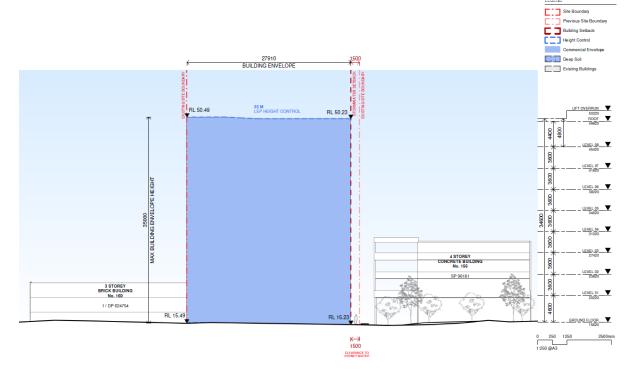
Proposed envelope - eastern elevation (Botany Road)
